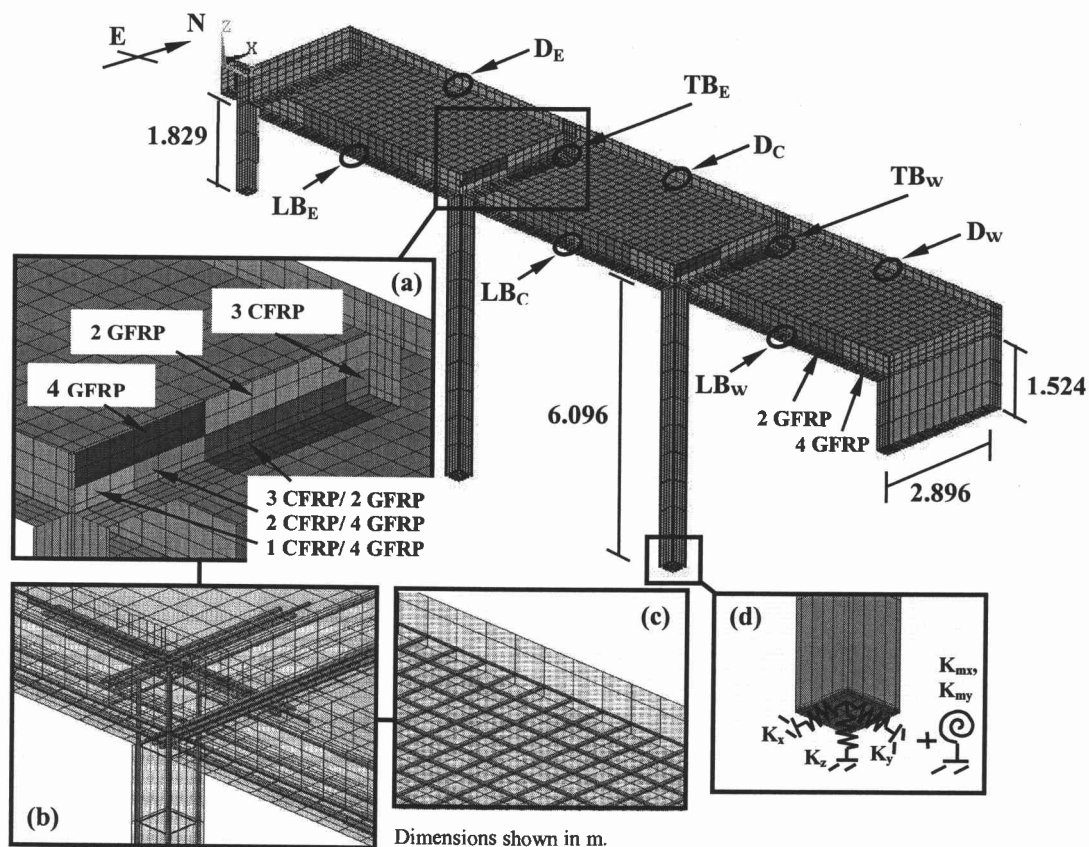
Bridge FE Modeling: (a) Typical FRP Reinforcement; (b) Typical Steel Reinforcement in Beams and Columns; (c) Typical Reinforcement in Bridge Deck; (d) Typical Soil-Structure Interface Modeling
